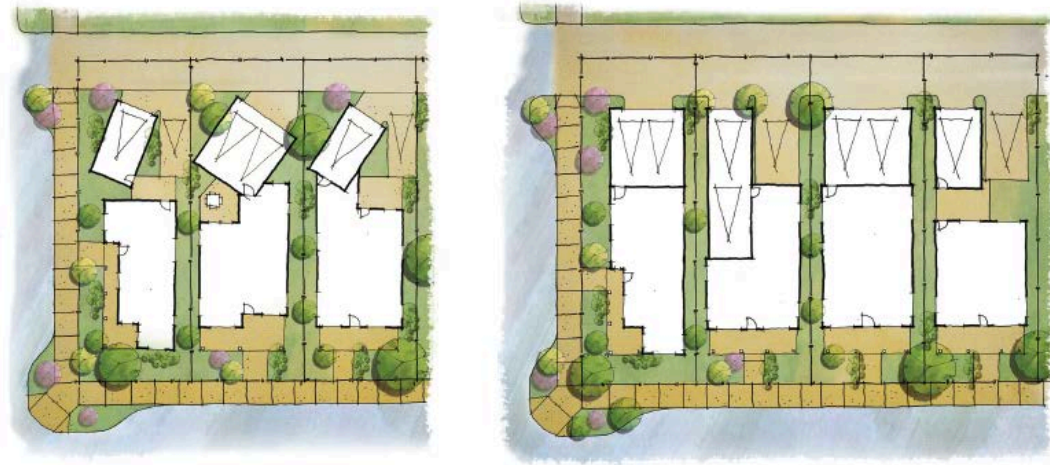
Single Family Small Lot Alley Loaded Elevations
